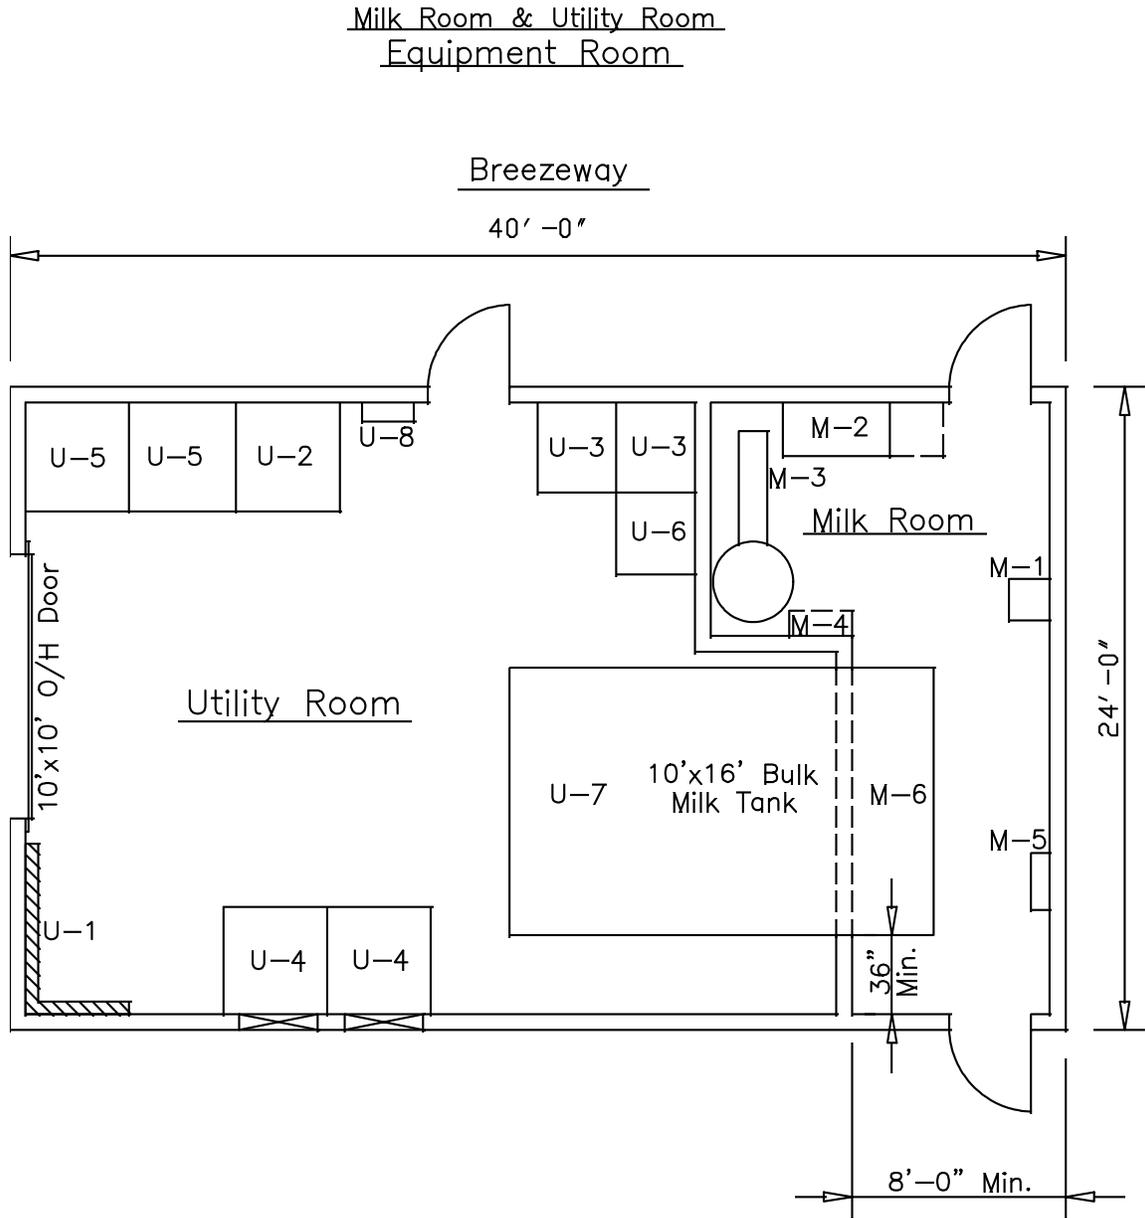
MILKROOM AND UTILITY ROOM EQUIPMENT LAYOUT SCHEDULE.
